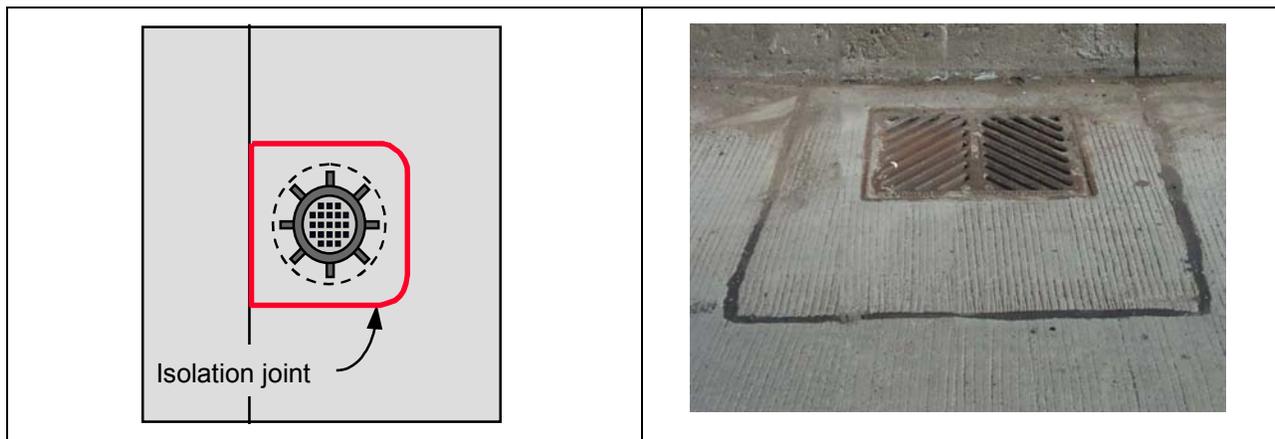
Square boxout (figure courtesy of American Concrete Paving Association. Photo taken at SR 2, Division Street and Francis Avenue intersection).
